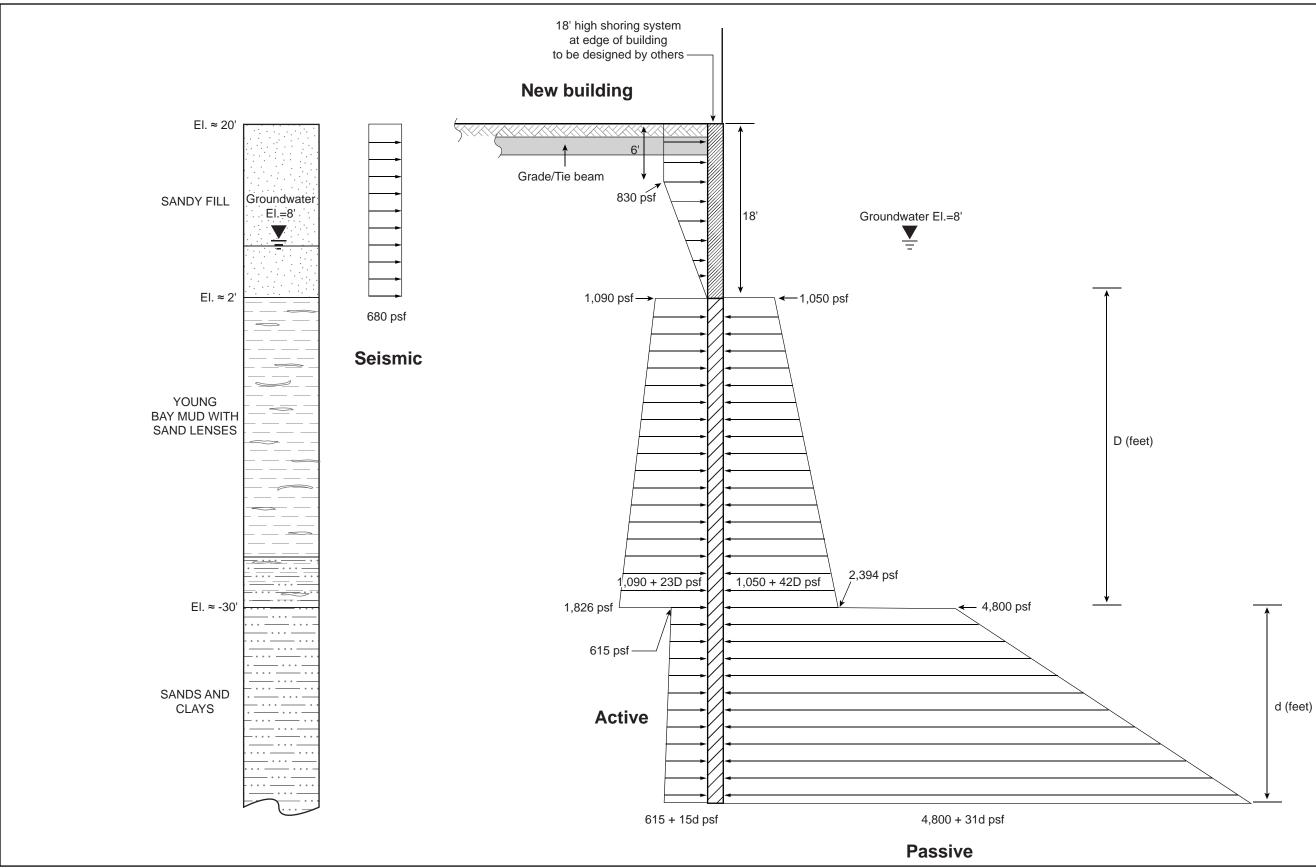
Recommended Lateral Pressures for 18-foot High Shoring System
